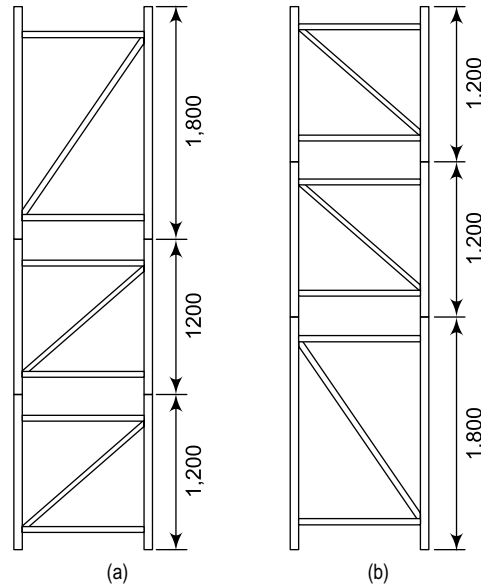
Two Arrangements of a Tower with Different Frame Arrangements.
